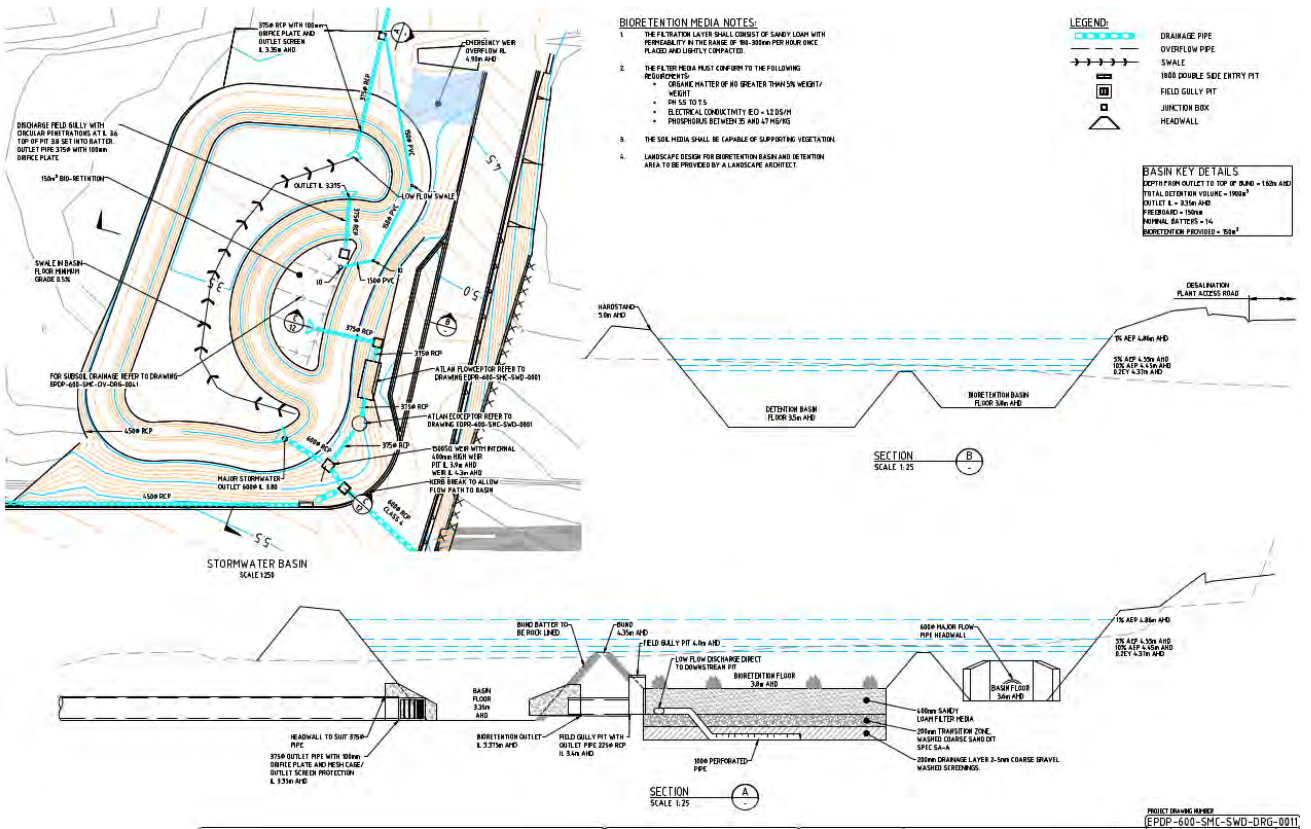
Stormwater basin Concept design (EDPD-600-SMC-SWD-DRG-0011)
